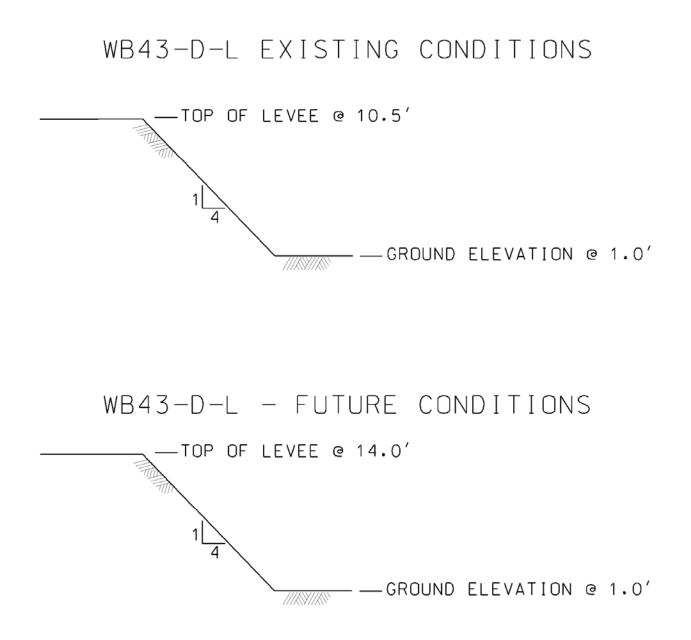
Typical Levee Design Cross-sections Westwego to Harvey Levees WB 43-D-L
